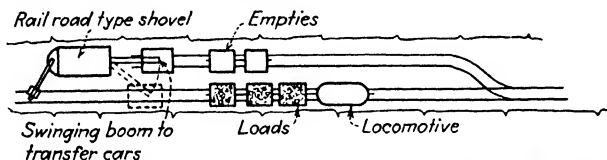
Cherry picker mounted on a shovel for transferring empty cars to loading track.
